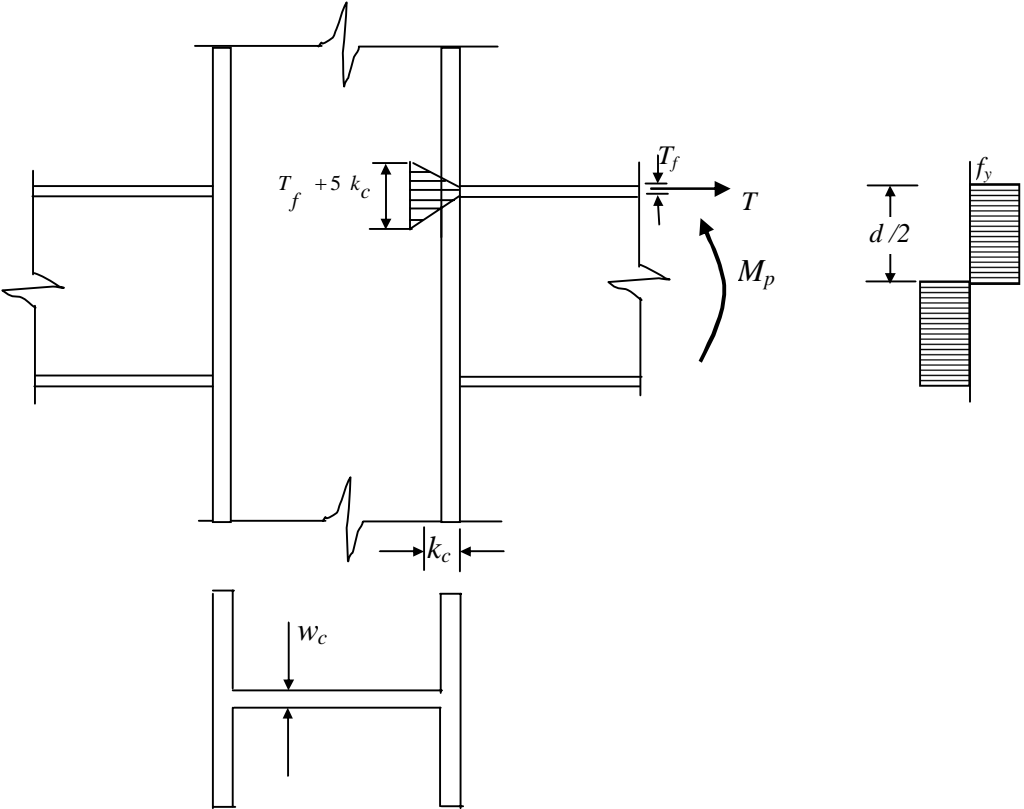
Assumed stress Distribution in beam column connection with no stiffeners
